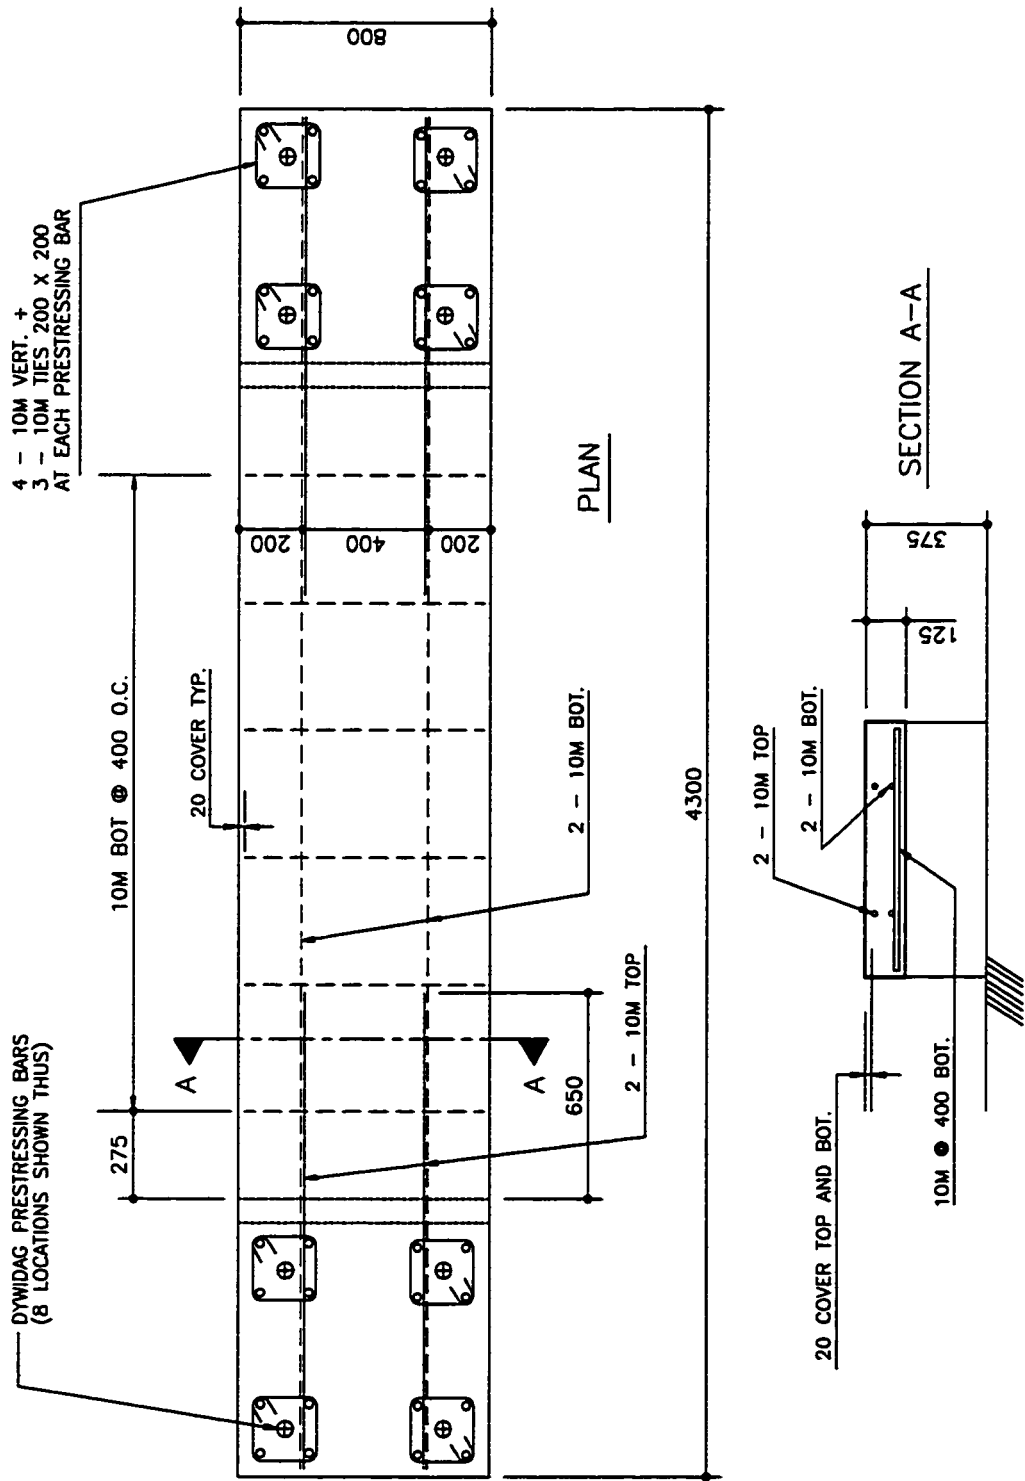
Reinforcement for slabs 30-2 and 100-2
